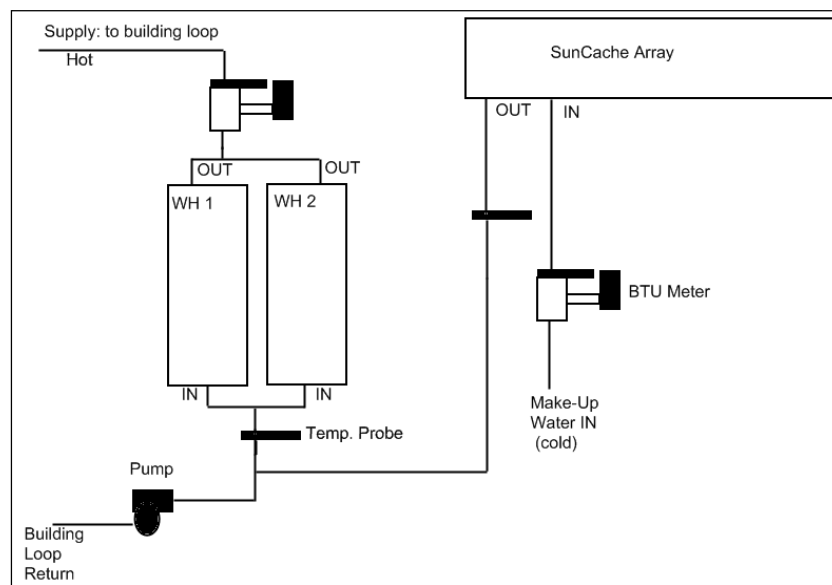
Hanford 1300 Building Plumbing Diagram
